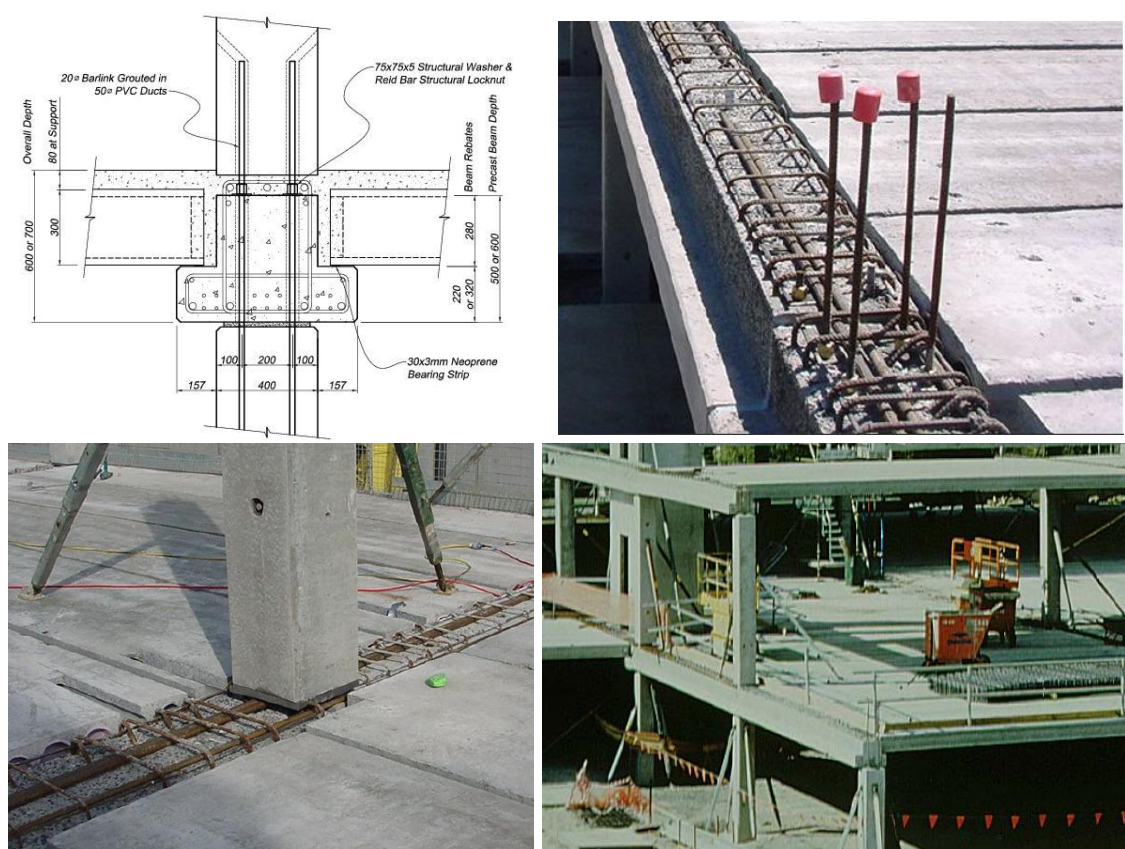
Beam-column connection specimens tested by Restrepo et al (1995)
